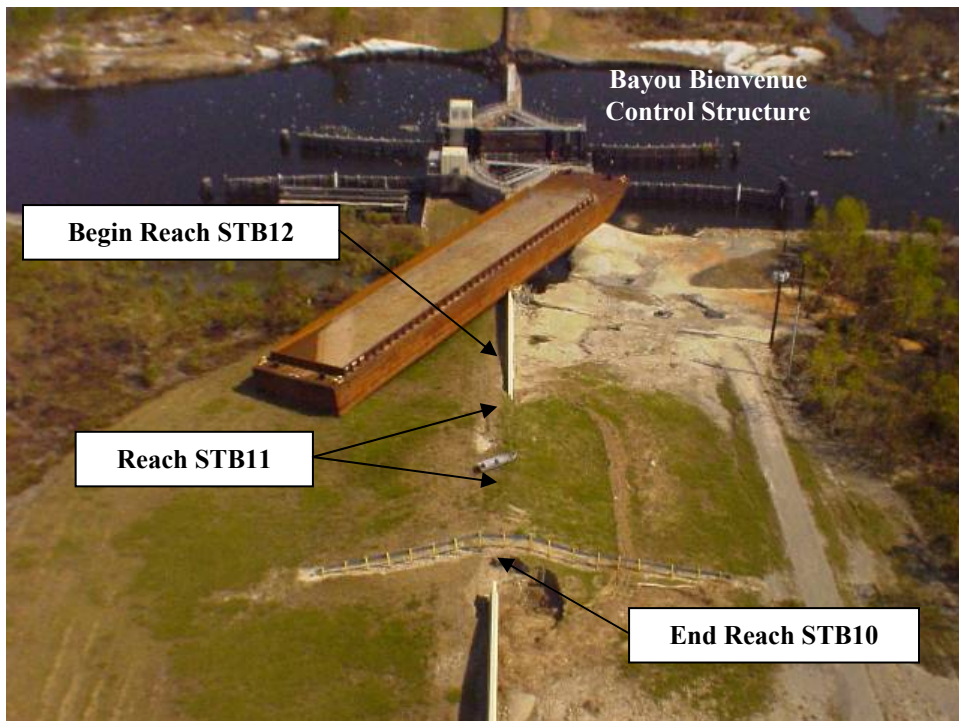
Short Levee Section Between Floodwalls (Reach STB11)
